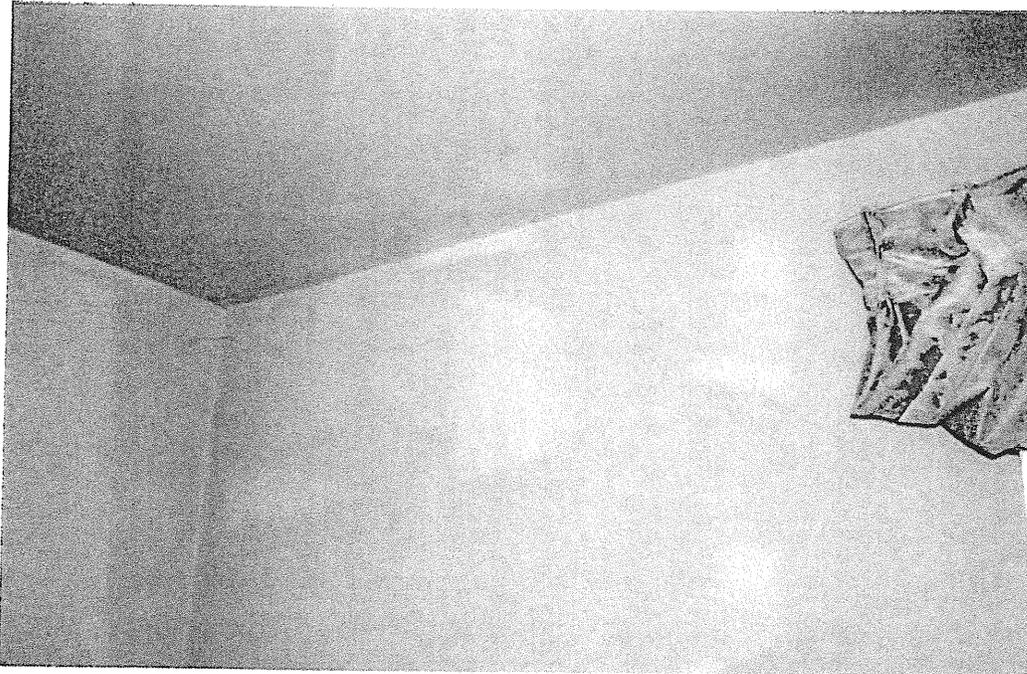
View of interior face of exterior wall. Note minor diagonal cracking in plaster.
